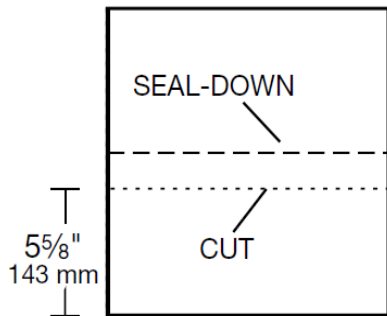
RidgeFlex™ Shingle Strip for Use as a Starter Shingle
